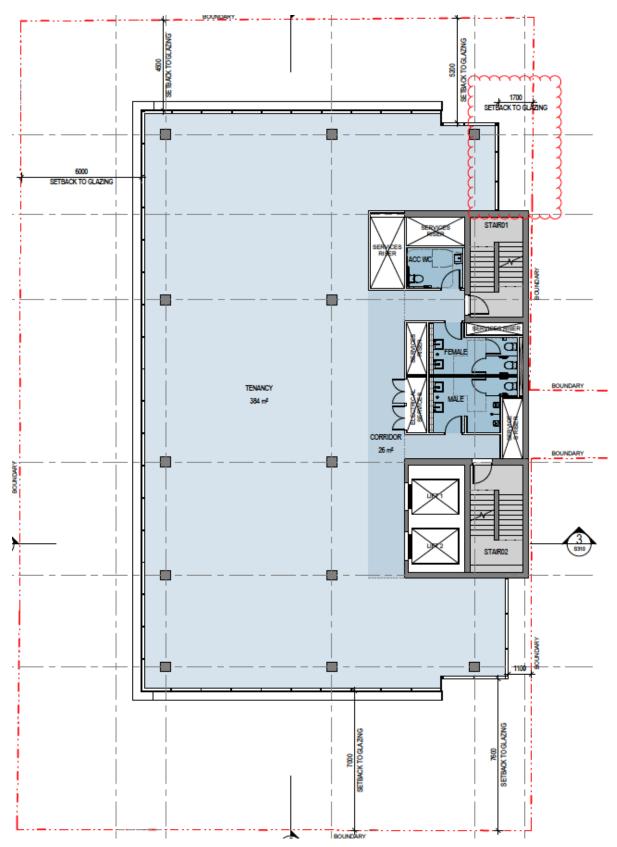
Proposed Level 8 Plan. From Drawing S105
